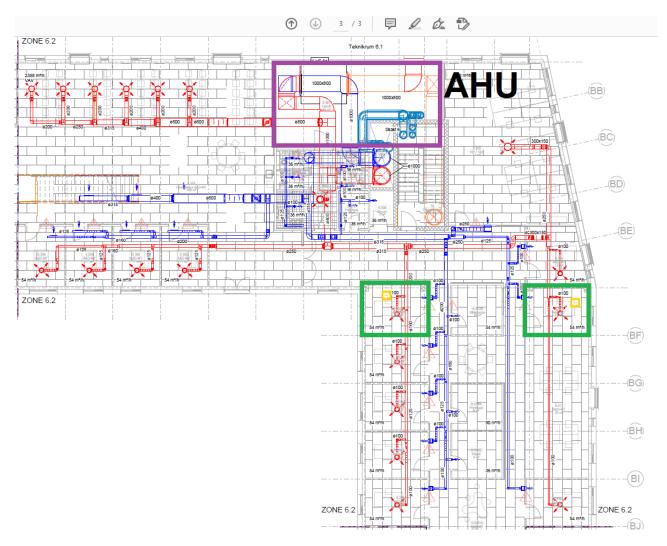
Location of the rooms of interest with additional monitoring equipment on the 2nd floor of the Zone 6 in the CREATE test building.
